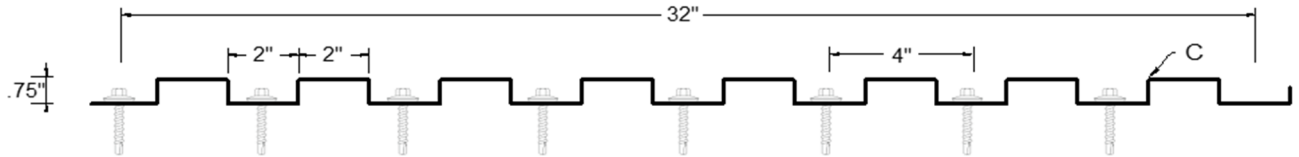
76 TMP LITE WALL .75-4-32 PANELS (8 SCREWS)
